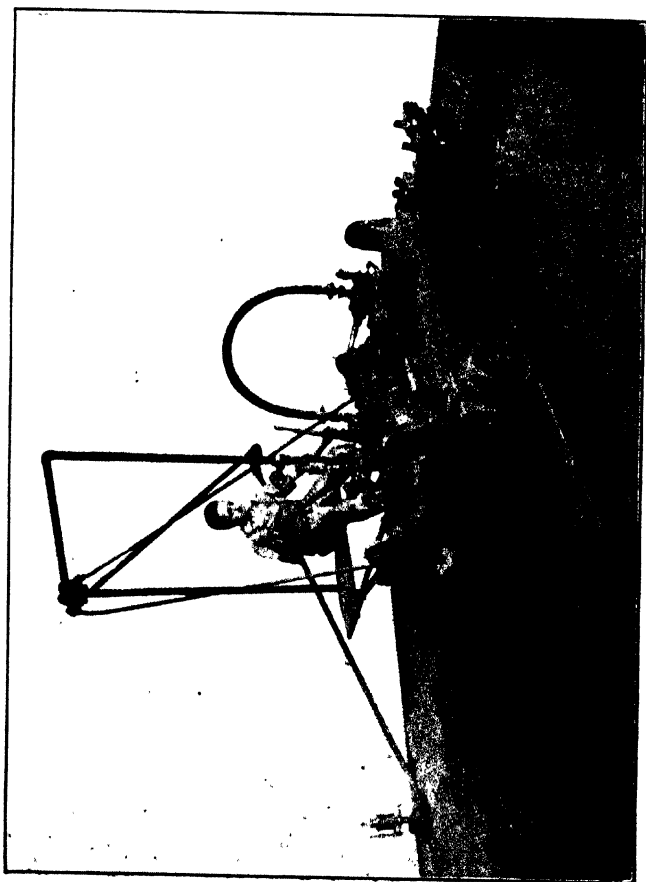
Ingersoll-Rand Undercutting Track Channeler, Type HF-3.
